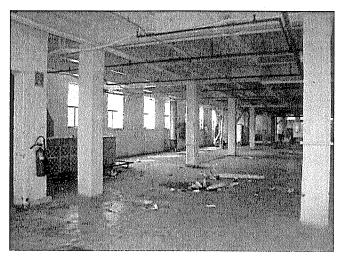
Overview - existing 3rd floor (4th floor is similar)
